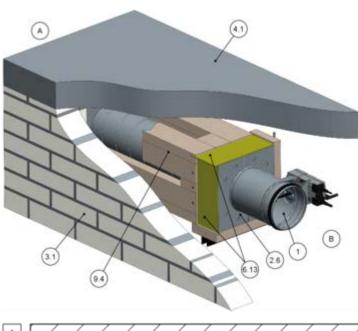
Dry mortarless installation remote from solid walls with installation kit WE2 (wall connection), three-sided cladding
